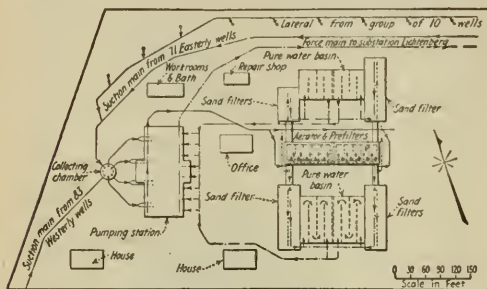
GENERAL PLAN OF PUMPING STATION AND DEFERRIZING PLANT OF BERLIN WATER-WORKS
